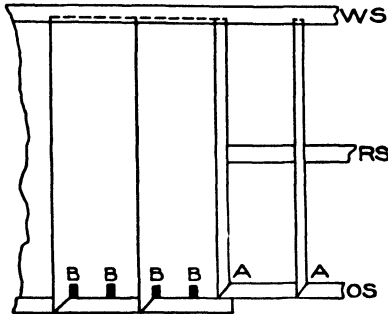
Part of Plan of Stair with Center String and with Outside String Mitered to Ends of Risers
